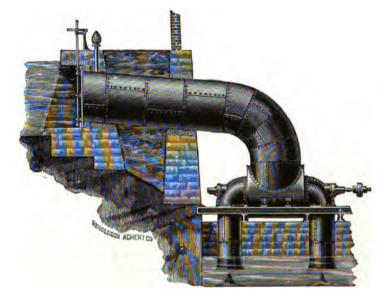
Arrangement of Penstock, Turbine and Draught-Tubes.
